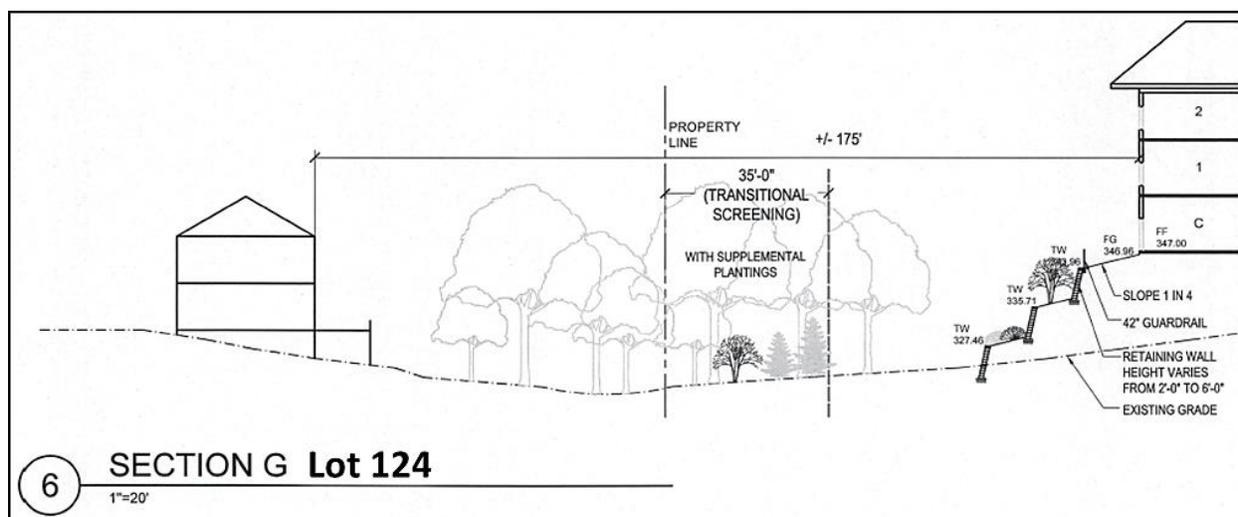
B: Cross-section Lot 124 and the assisted living facility, Source: GDP/SE Plat, Sheet L-3
